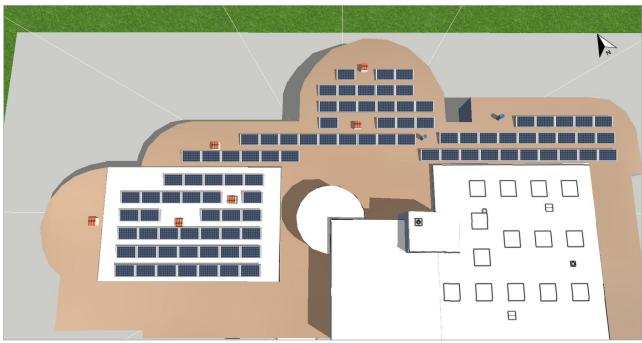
Module Area - Arbitrary Building 02-Mounting Surface Northeast
